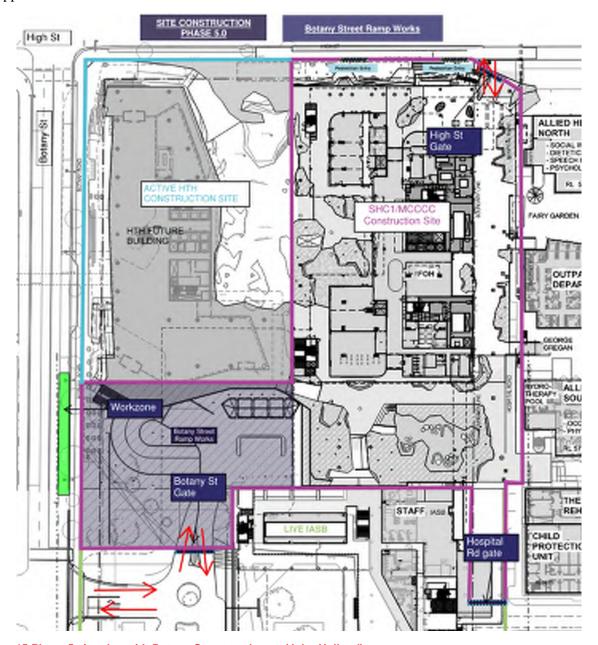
Phase 5 site plan with Botany Street workzone (John Holland)
